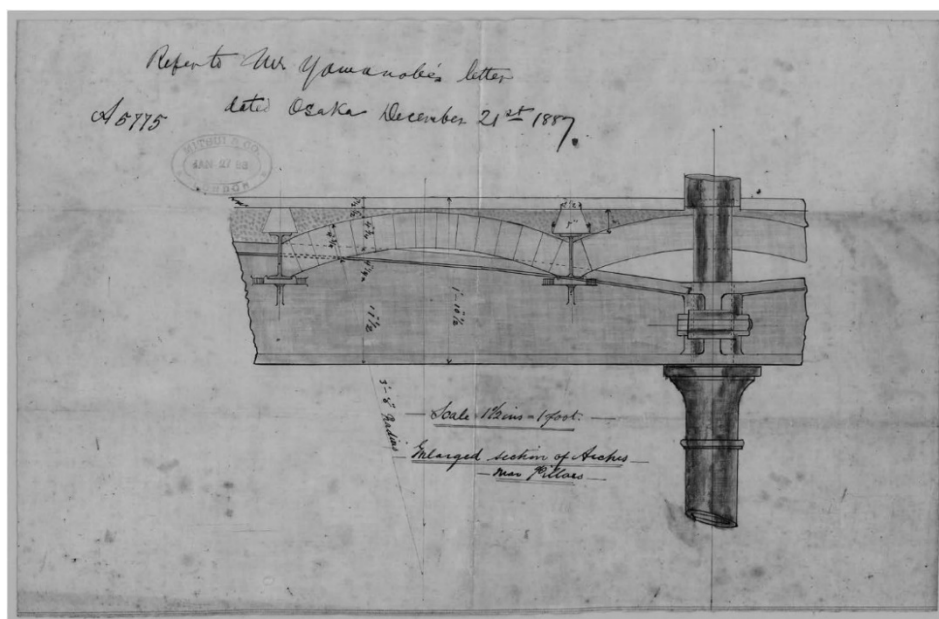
Fireproof floor detail, Mill No.3 at Osaka Bōseki [2-14]
